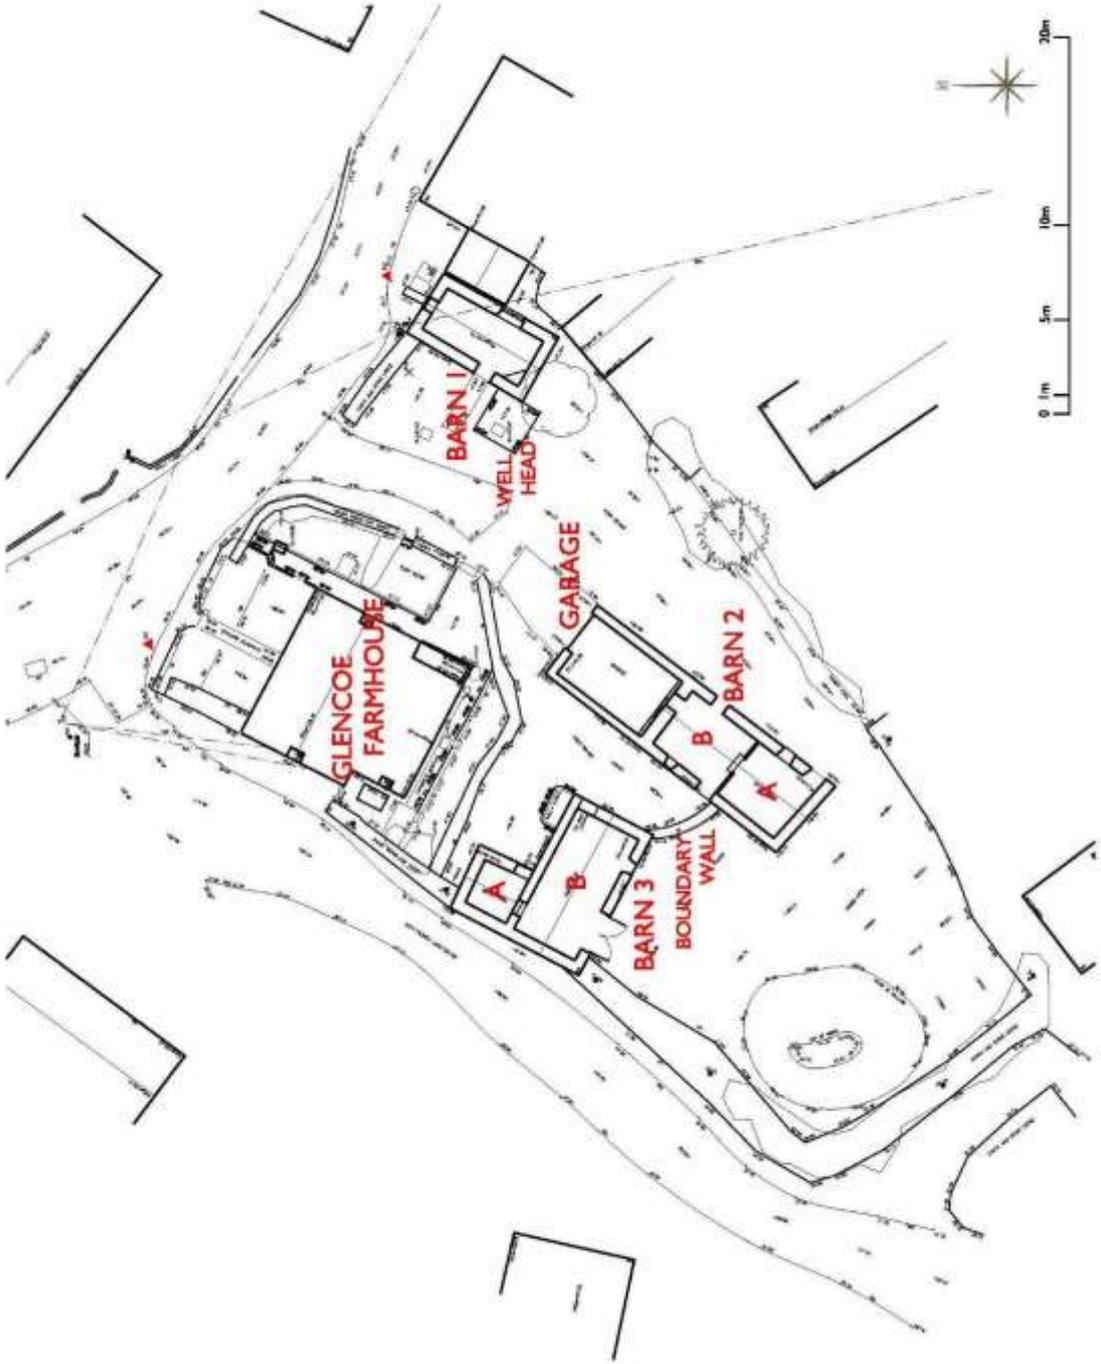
Ground plan of barns (Andy Travers, ATA Practice)
